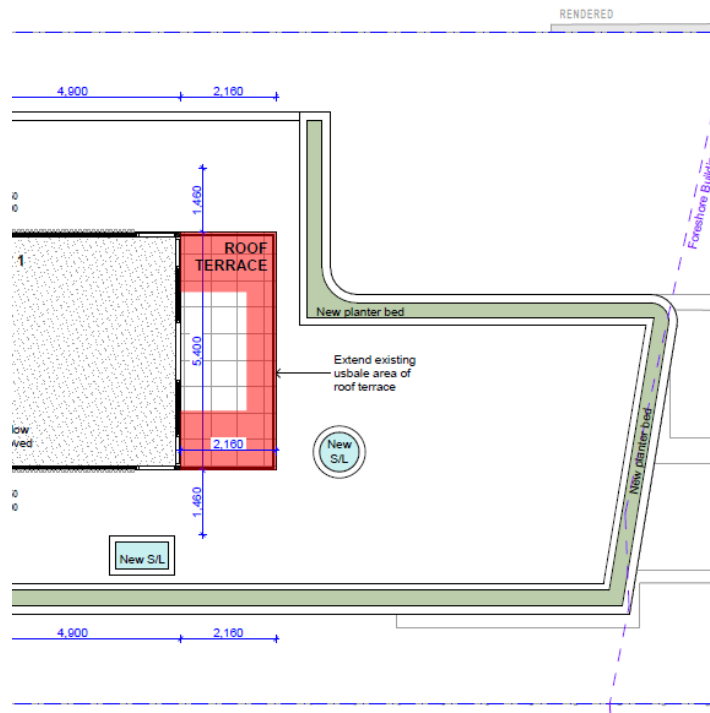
Non-compliant landscape planter within the existing parapet which will be raised and stands within the foreshore area
